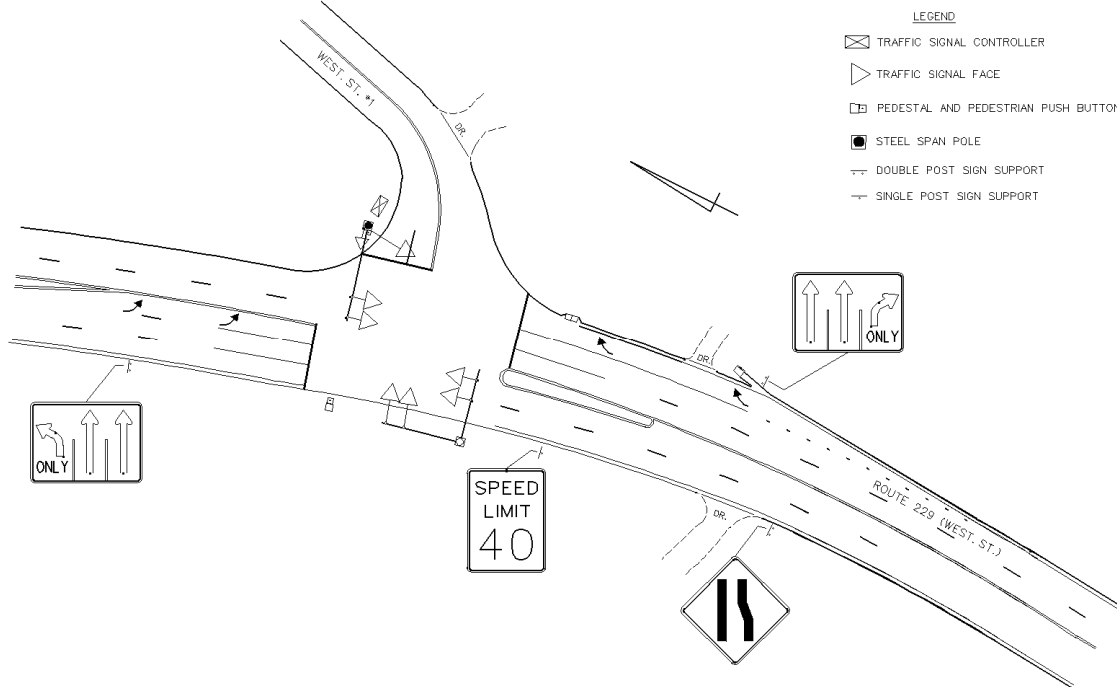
B Intersection of Route 229 and West Street #1, Southington
